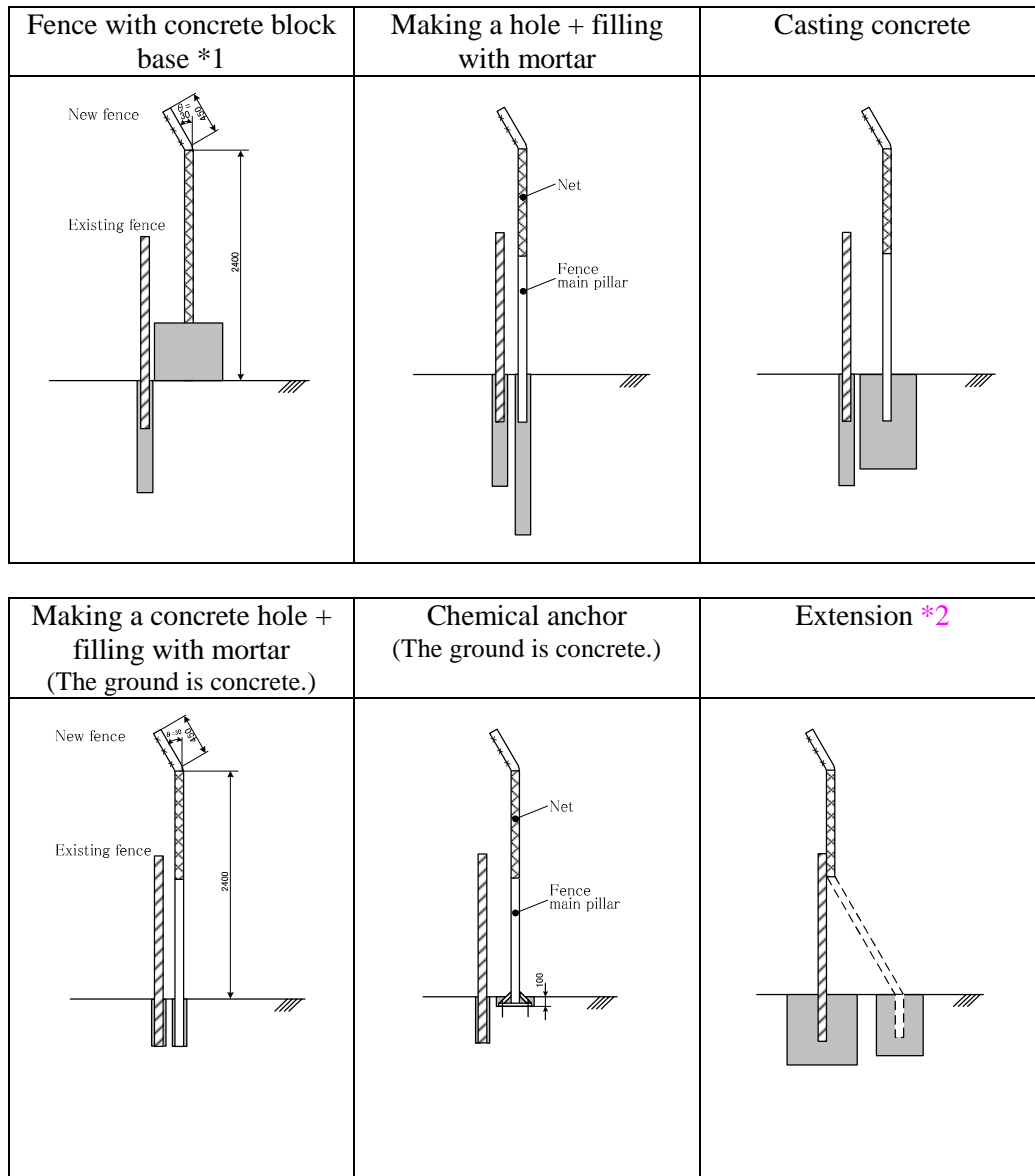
Examples of Improvement Plans for Existing Fence
